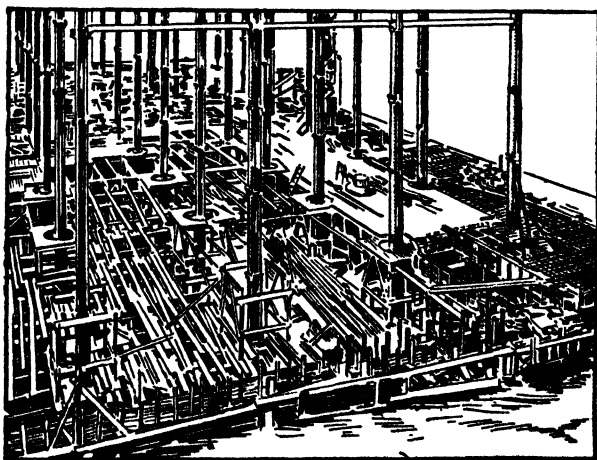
Structural Steel H Sections Used as Cores for Reinforced-Concrete Columns Supporting Girderless Floor Construction
